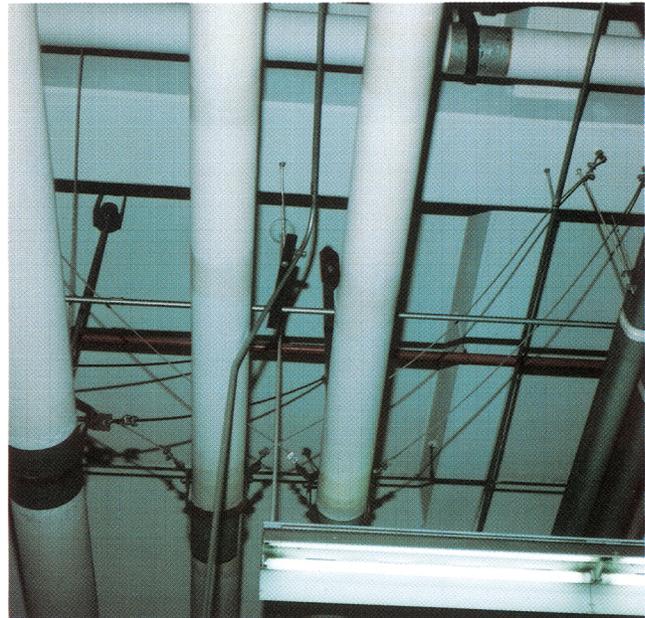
The cable sway brace system prevented pipe damage (5th floor location, 5 stories, approximate maximum seismic excitation - 0.45 g horizontal, 0.32 g vertical).
